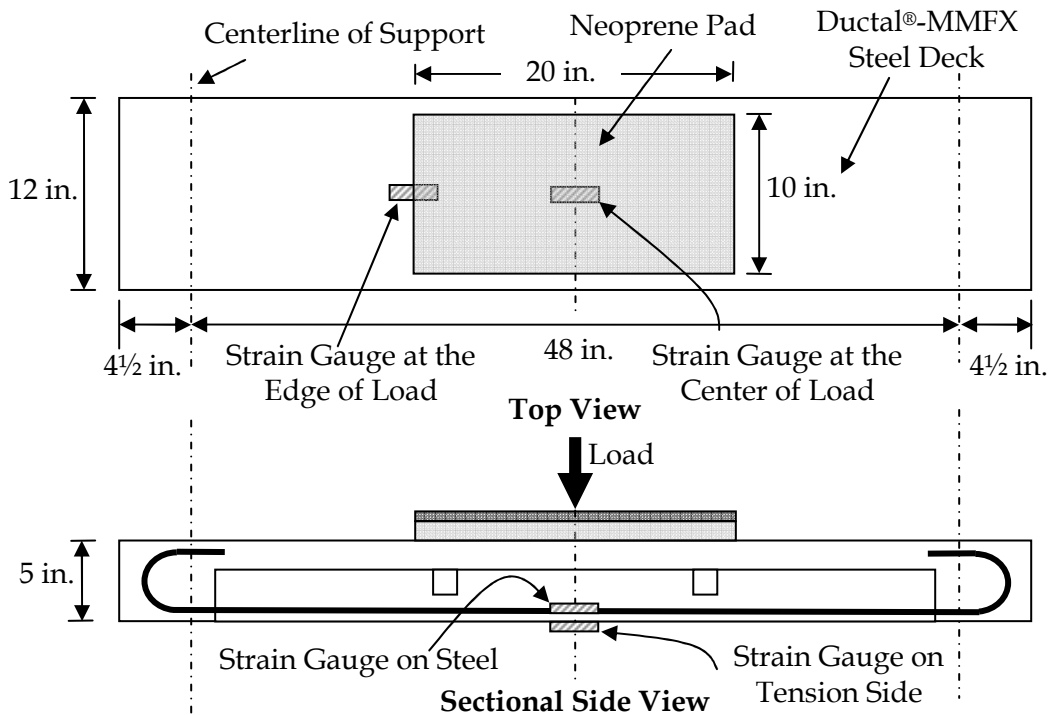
Instrumentation Plan for the Single-T Simple-Span Specimens
